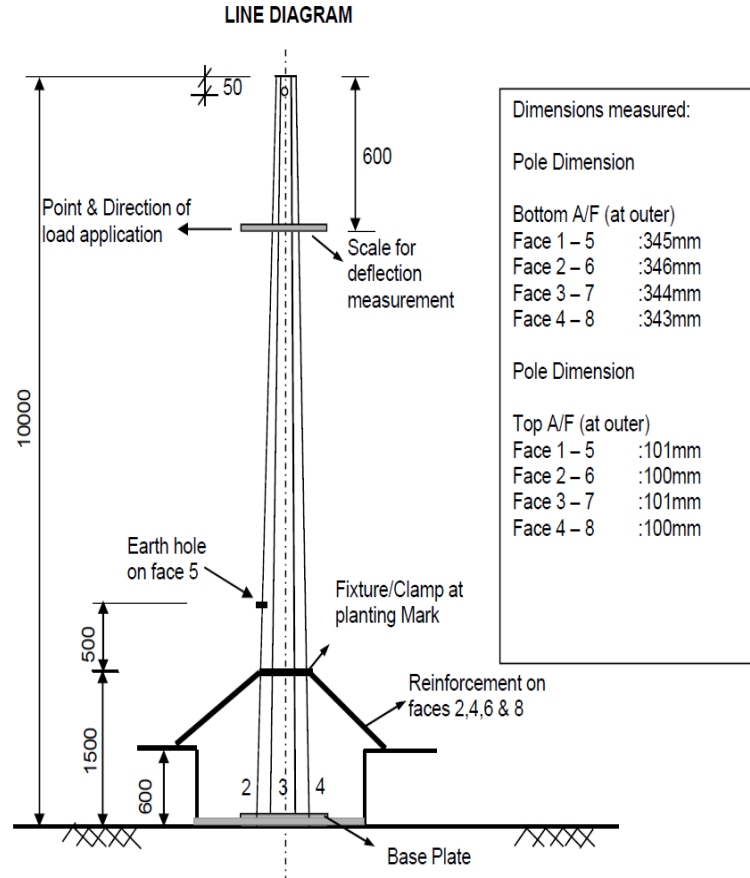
Physical dimensions and mounting arrangement of pole.
